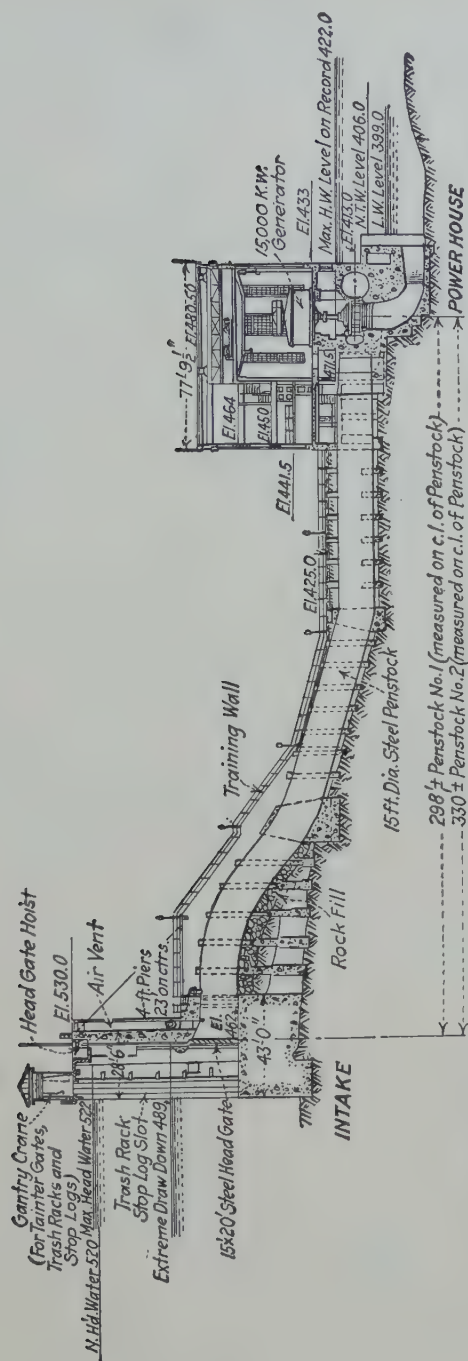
Bartlett Ferry plant, profile, penstock and power house. (Courtesy of Stone and Webster Engineering Corporation.)
